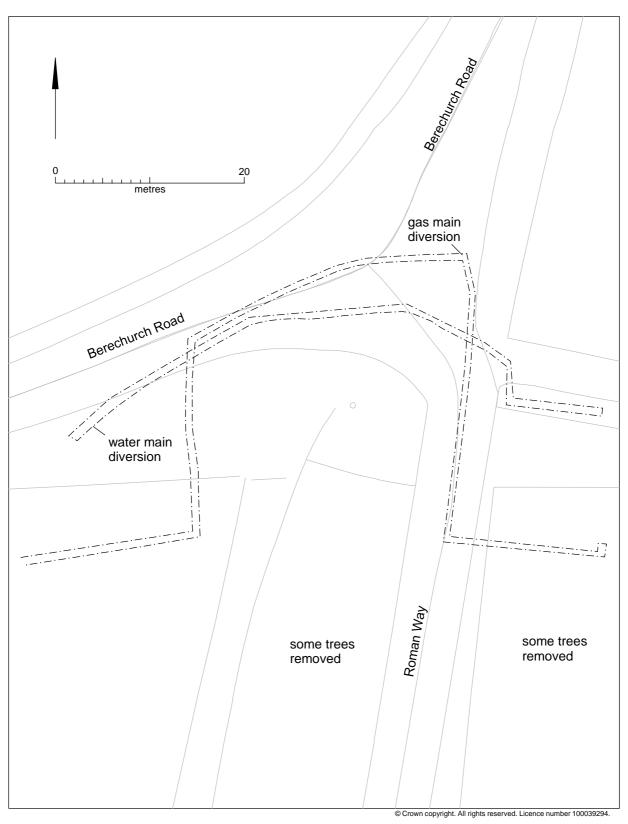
Plan of the water and gas main diversions at the junction of Berechurch Road and Roman Way.
